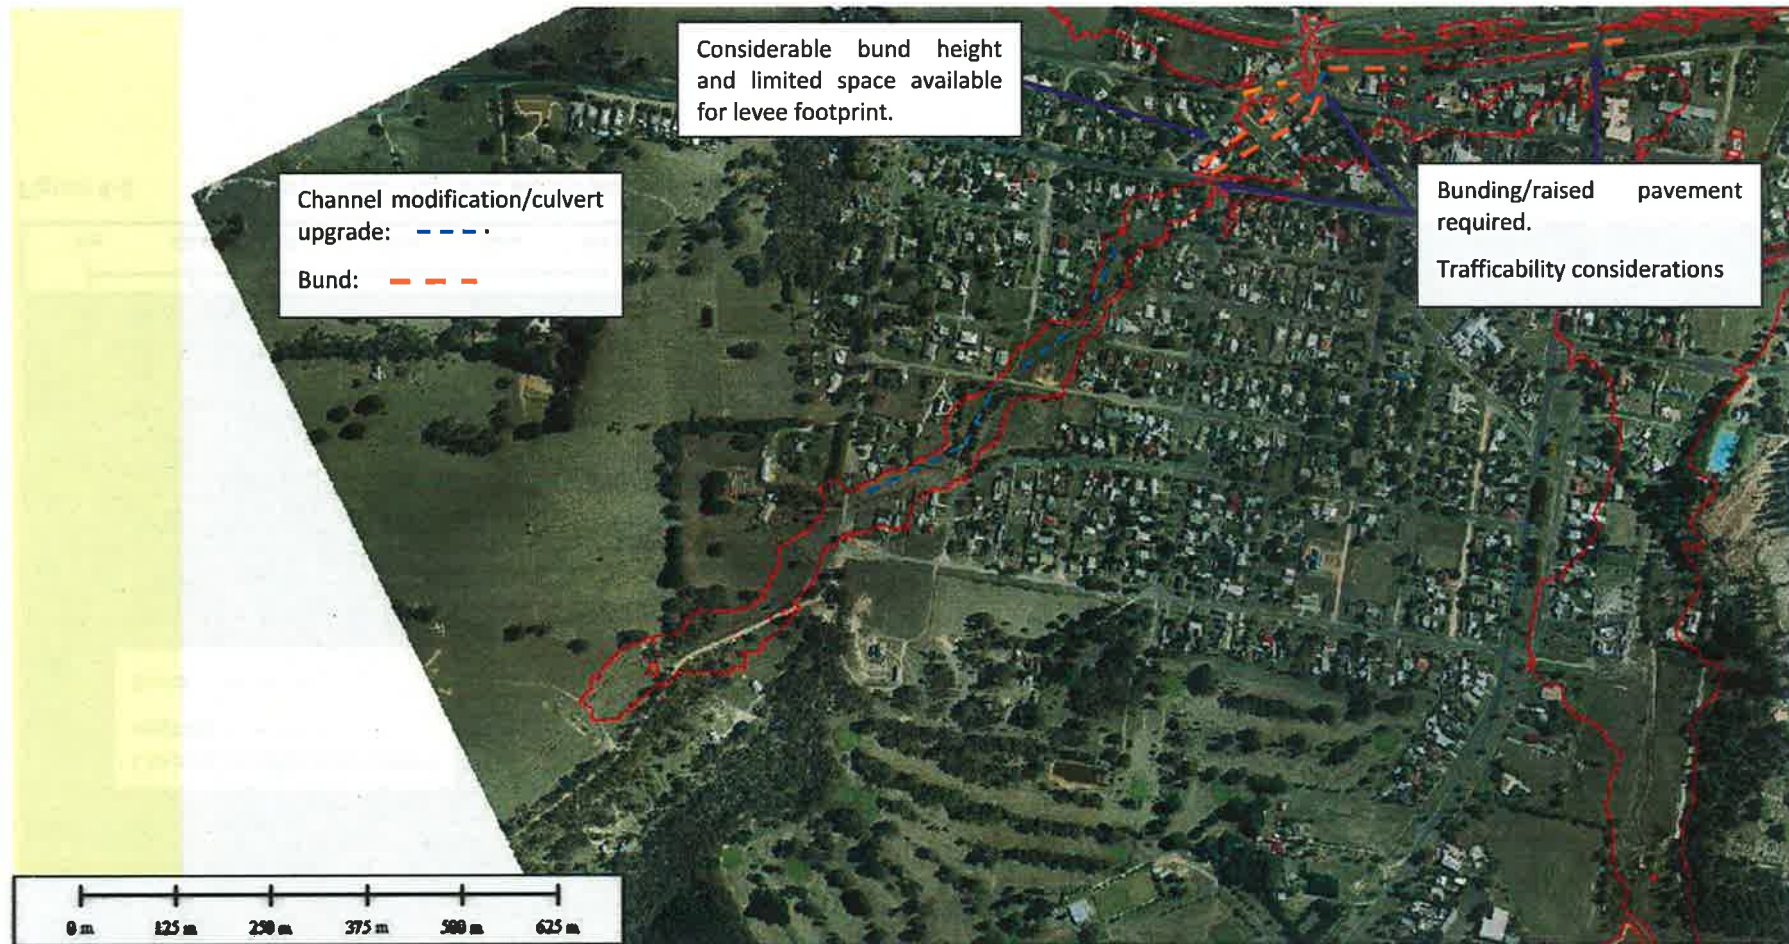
Ding Dong Creek – General works and potential construction constraints
